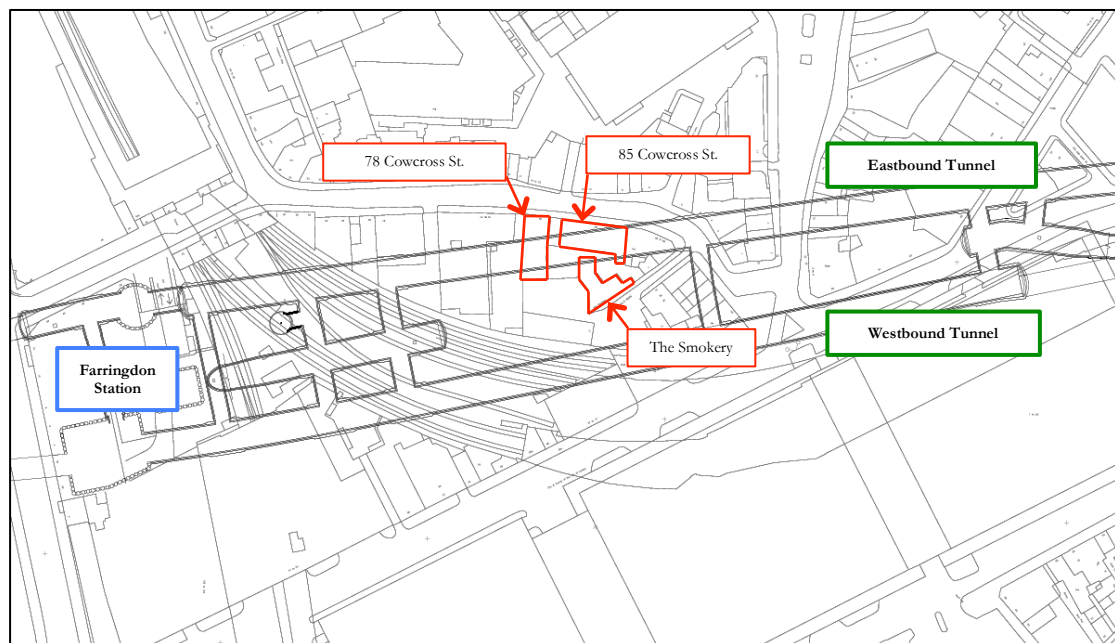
Location of piled buildings relative to Farringdon Station and Crossrail tunnels
